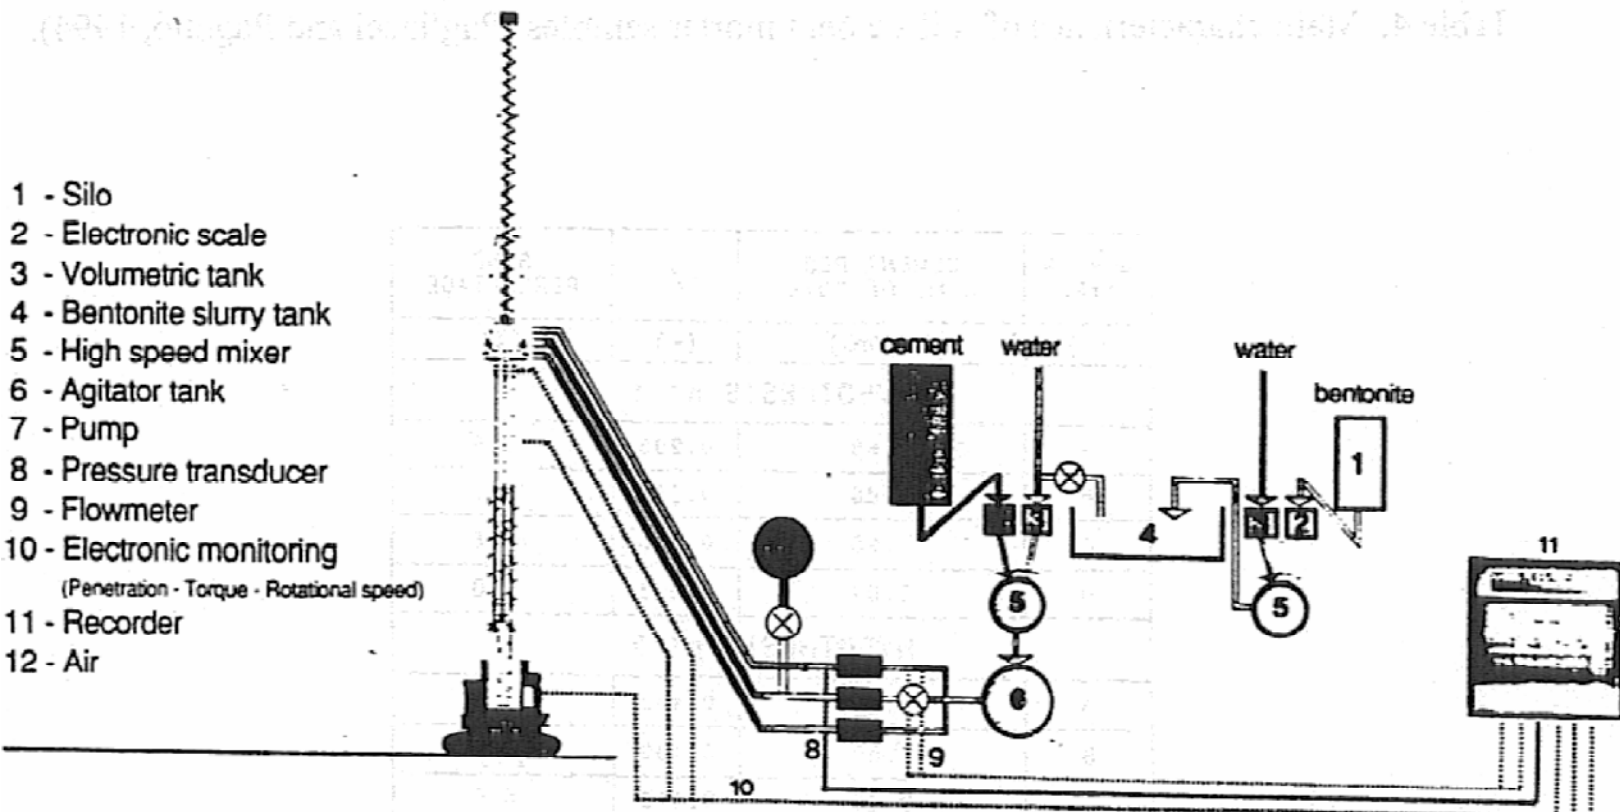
Schematic of equipment and grout plant (Rodio, Inc., 1990).
